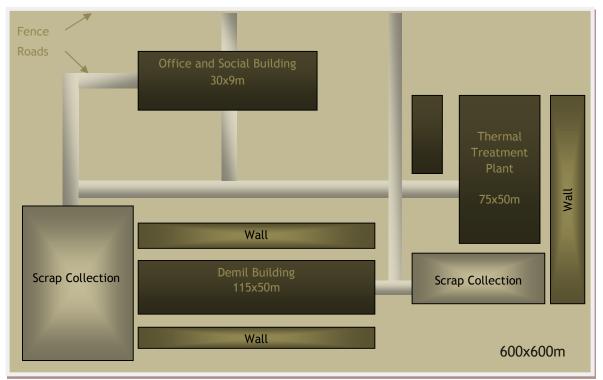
Schematic ADP factory Plan for South Africa (courtesy BKS)
